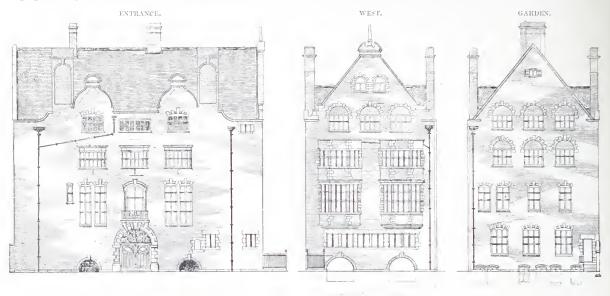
ELEVATIONS OF A CORNER HOUSE AT QUEEN'S GATE. R. NORMAN SHAW, R.A., ARCHITECT, 1891.
